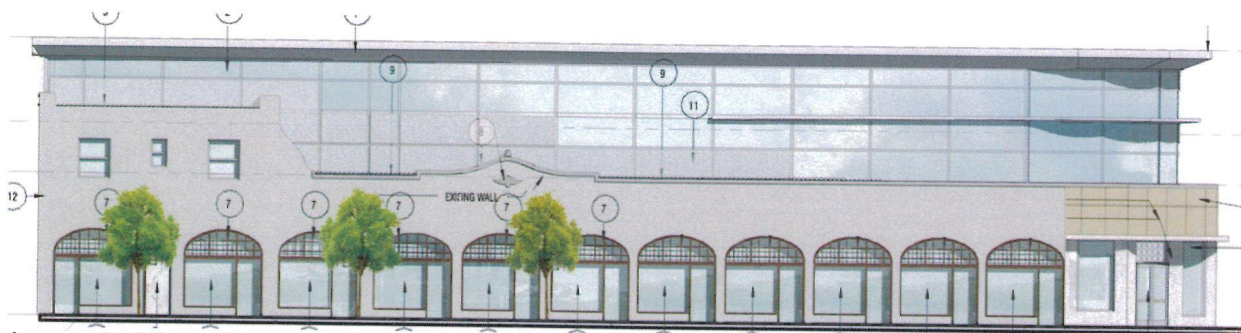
Alternate concept of Michigan Avenue façade as recommend by staff
